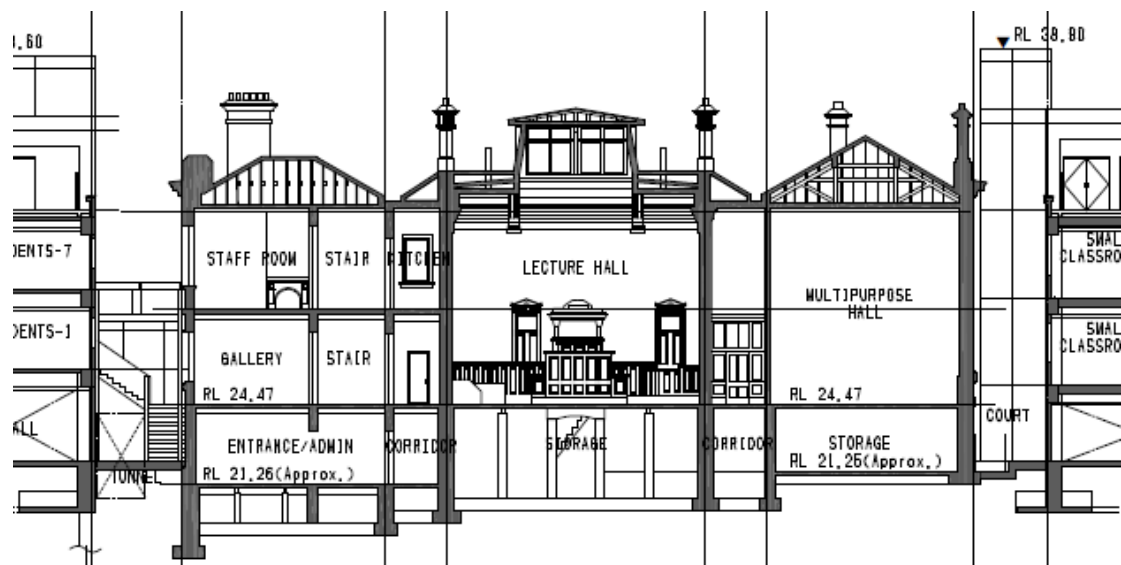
Detail from the longitudinal section through the 1892 Courthouse building. (Azusa Sekkei Architects)
